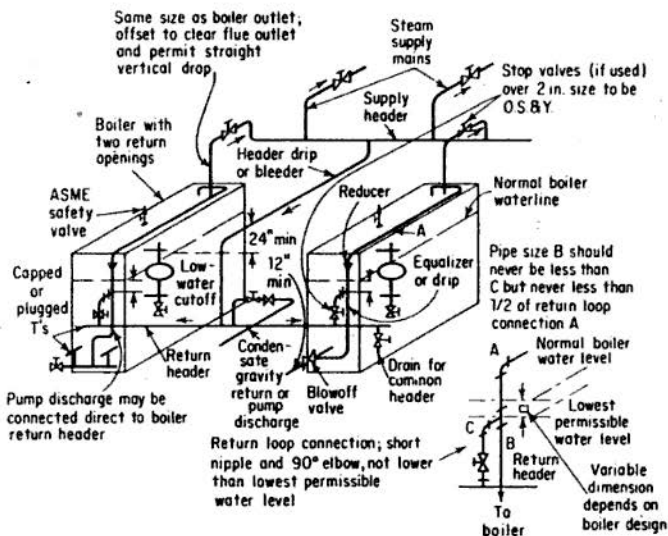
ASME recommendations for connecting steam-heating boilers in battery.
